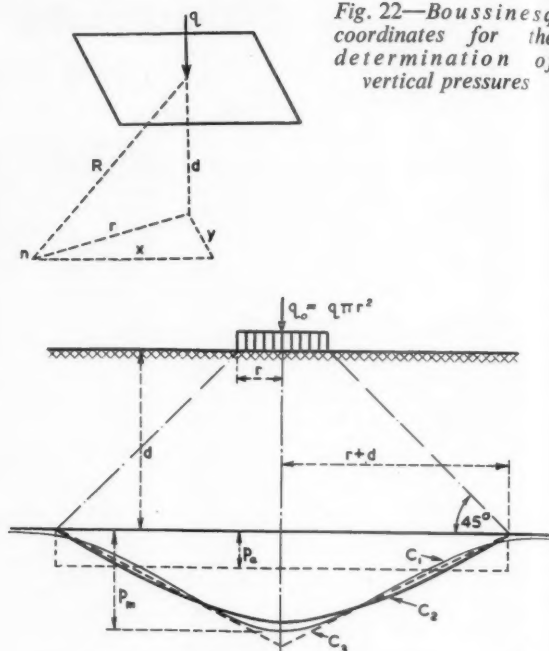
Distribution of vertical pressure beneath a loaded footing
